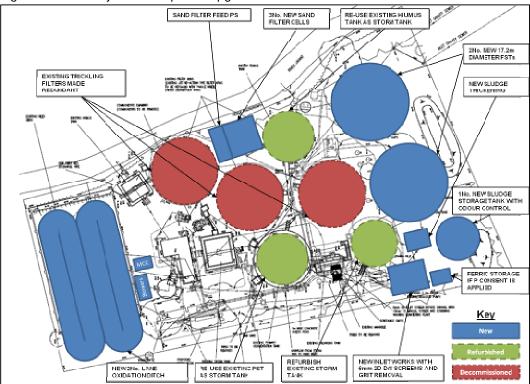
Site Layout for Proposed Upgrade to Lavant WwTW
